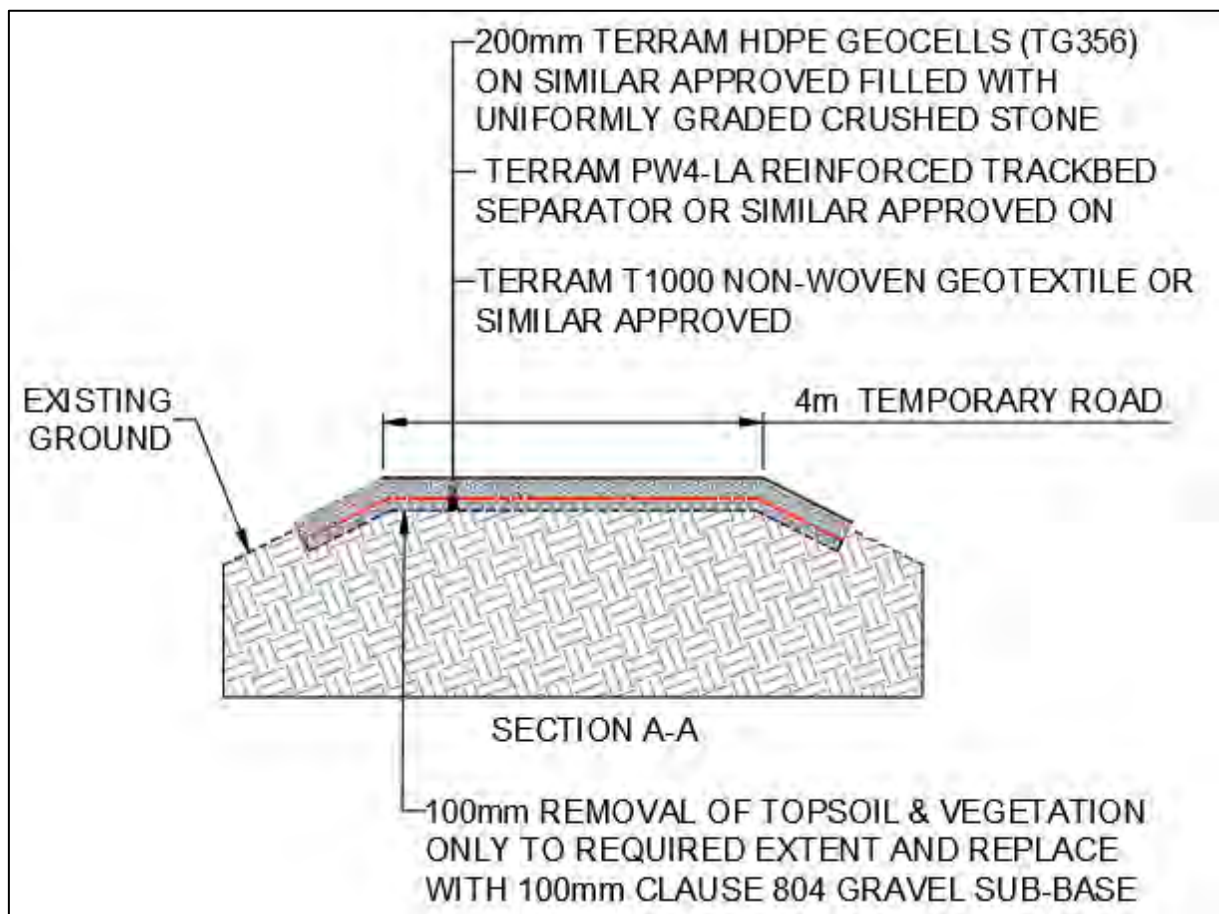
Proposed temporary soils reinforcement on Suir Island flood protection berm
